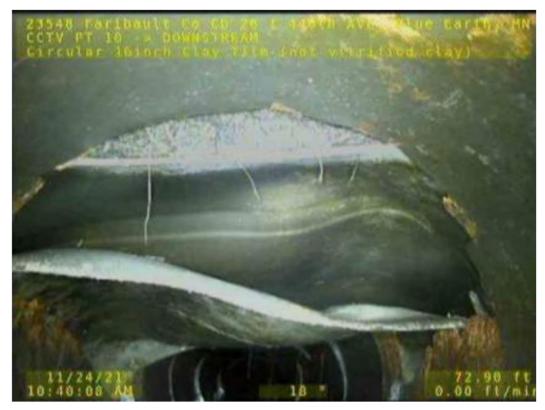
Dual Wall Patch Collapse (Station 15+00)
